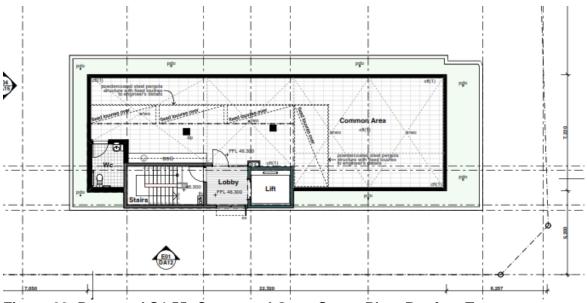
Proposed S4.55 - Communal Open Space Plan- Rooftop Terrace
